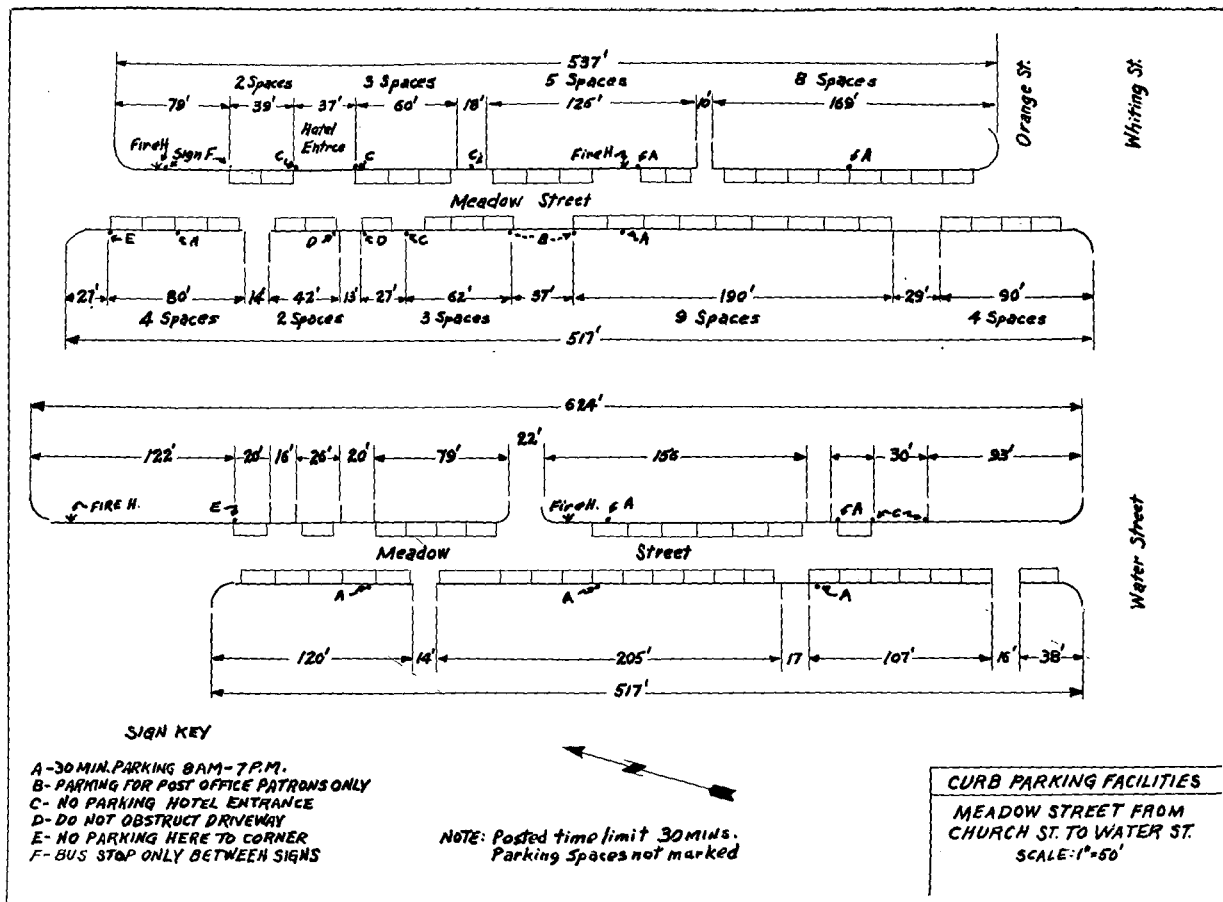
Typical Sketch Showing Curb Parking Facilities and Layout
